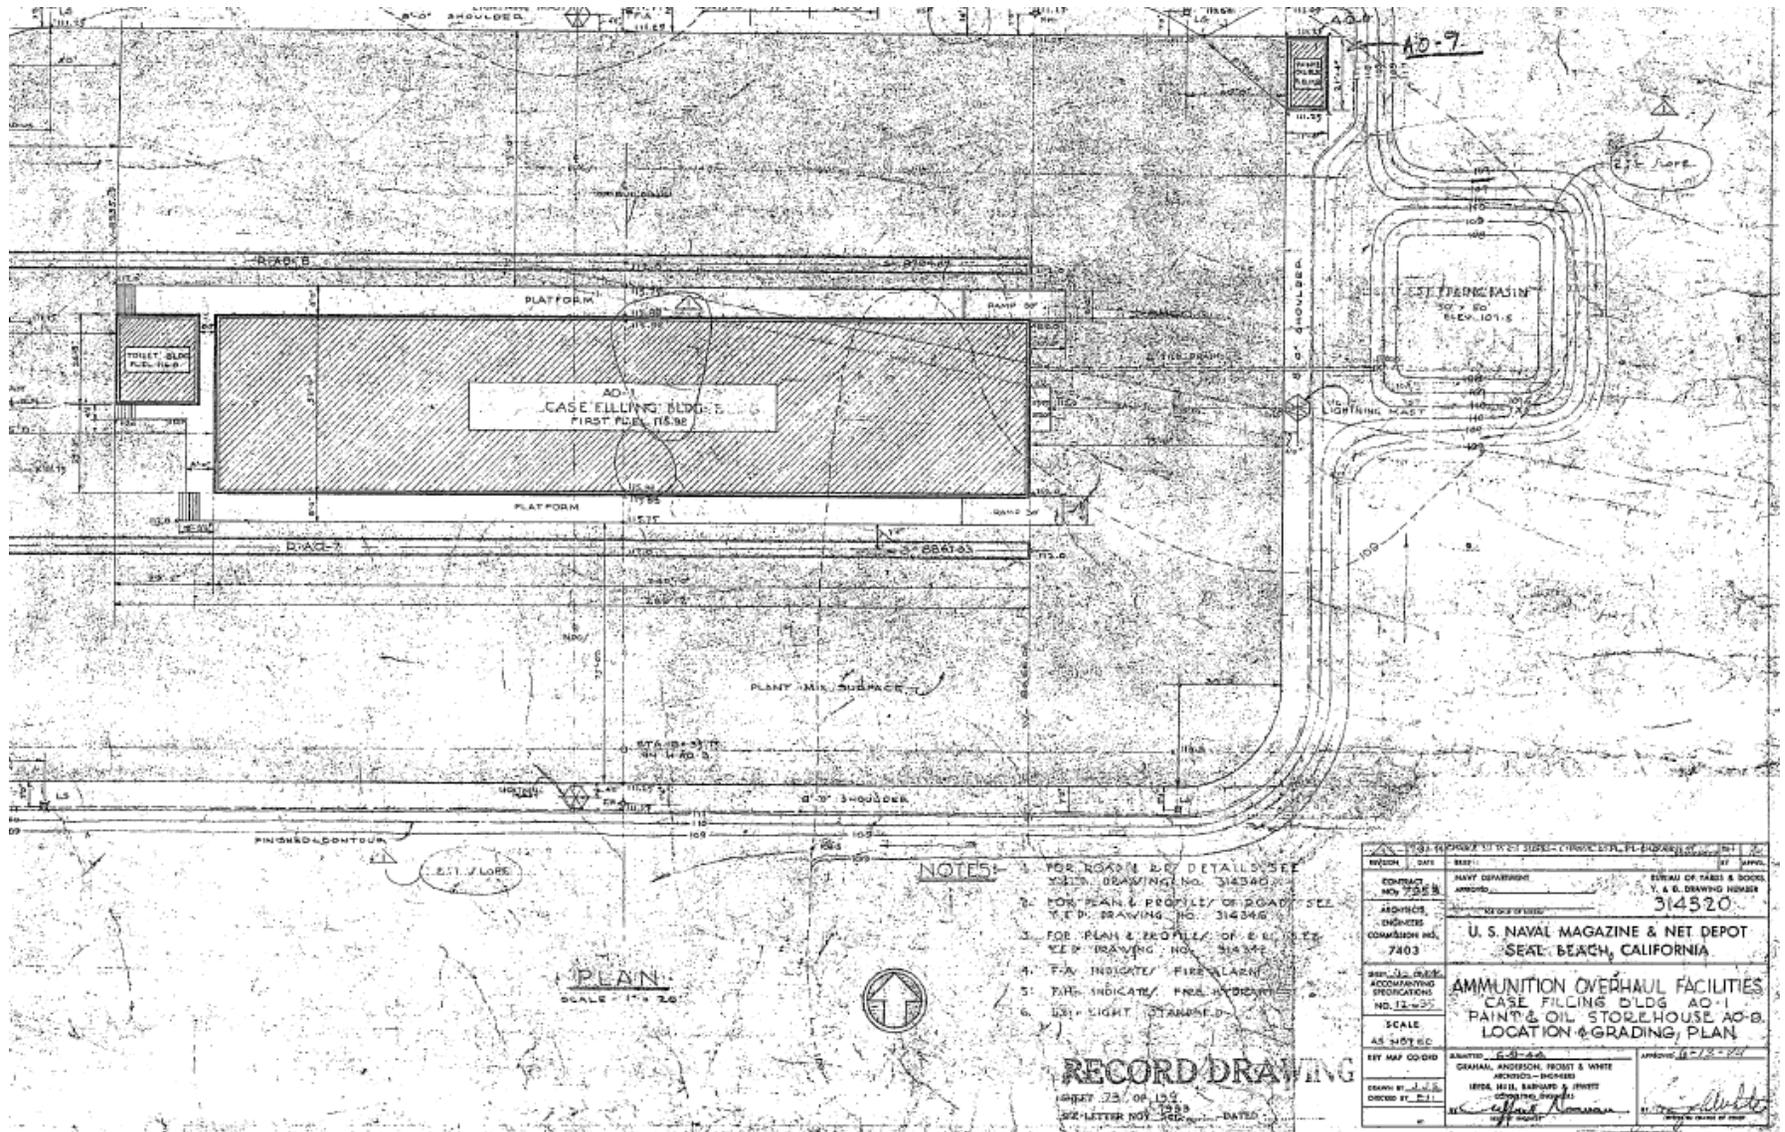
1944 engineering diagram with drain pipe and settling basin to east of Building 94
